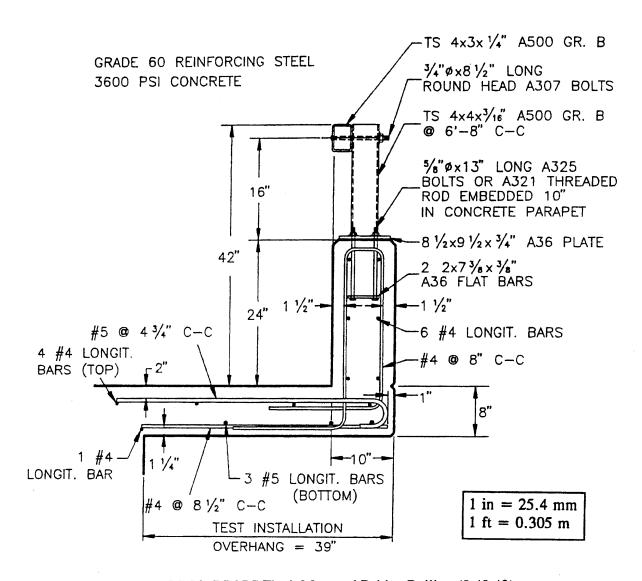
BR27C Flush Mounted Bridge Railing (8,40,42).
